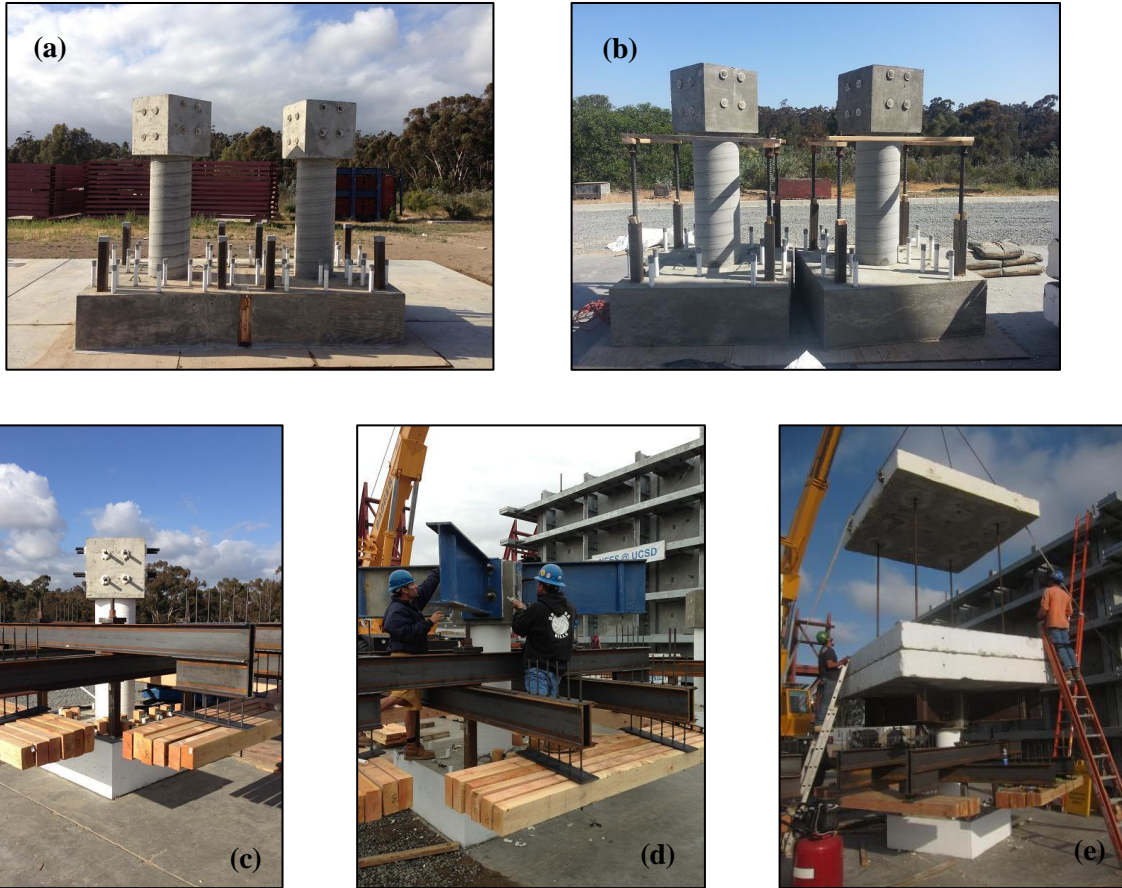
Photos from the assembly of the specimens; (a) concrete footings, columns and load stubs, (b) steel rods and grouting of the HSS pipes, (c) restraining system, (d) steel supporting beams and (e) placement of the mass blocks.
